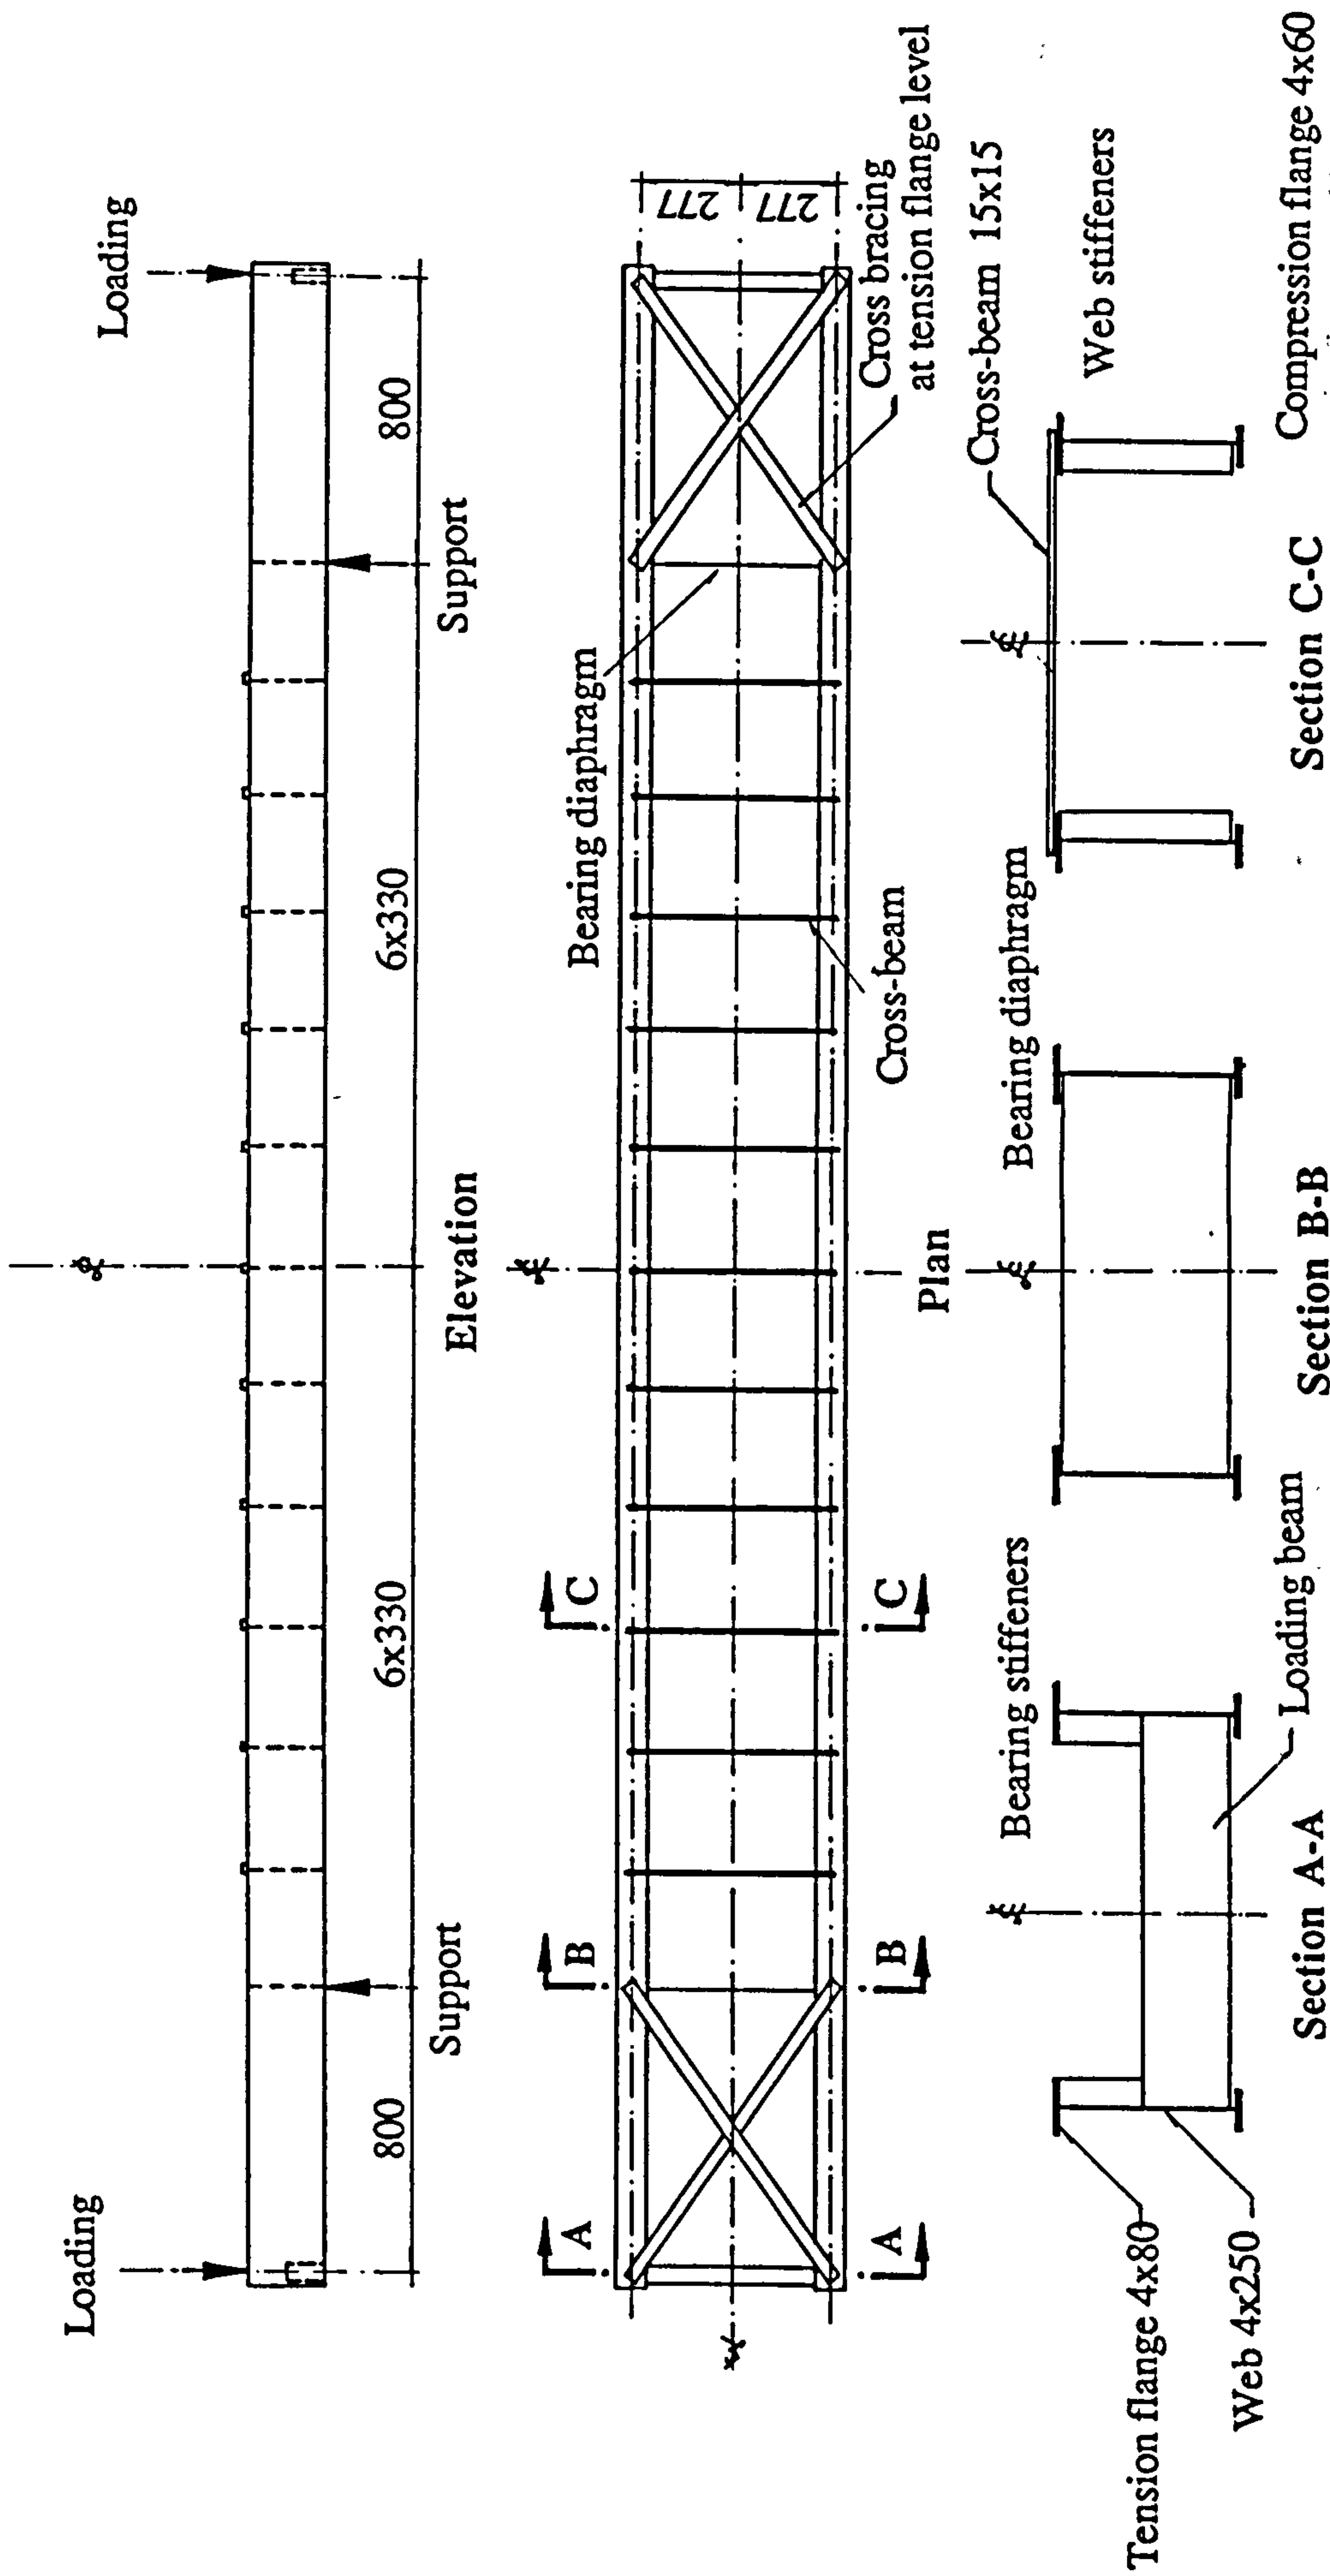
General arrangement of the Welding Institute test Unit : mm
